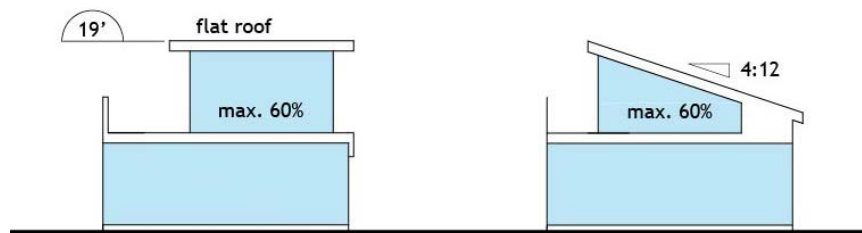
Height and partial second storey for roofs with pitch < 7:12
